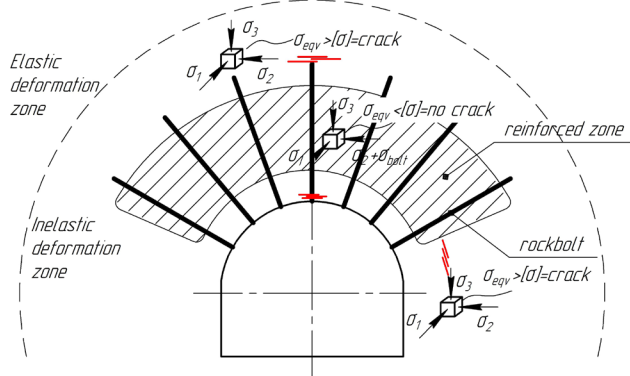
Scheme of the occurrence and development of stratification around a roadway with roof bolts
